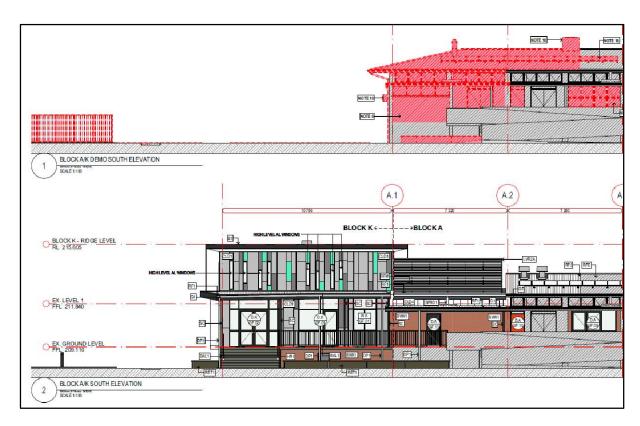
Proposed new administration building Block K (source: Glendenning Szoboszlay Architects)
